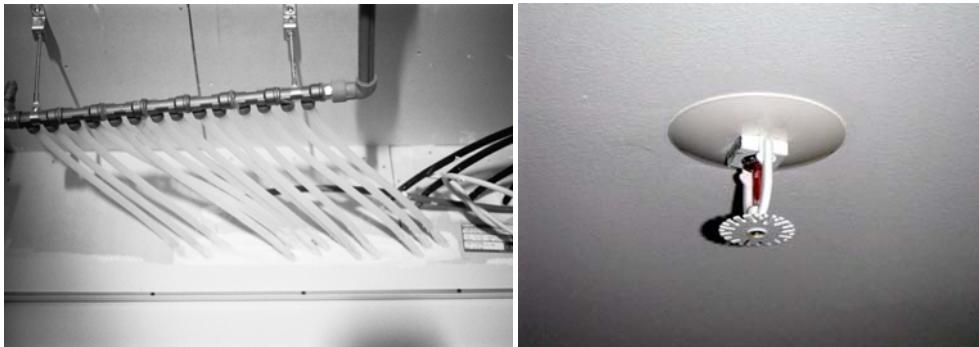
Connections of PEX pipes in the suspended ceiling outside an apartment (left) and a spray nozzle on a finished ceiling surface (right).
